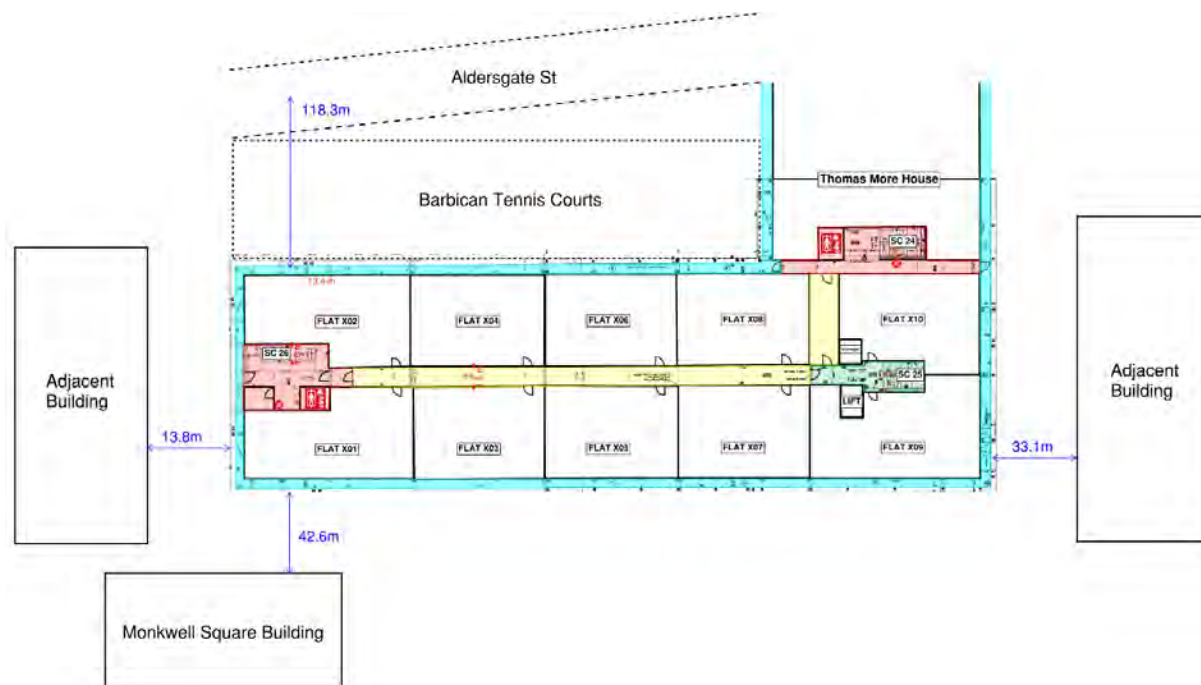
Existing arrangement for Mountjoy House and adjacent buildings
